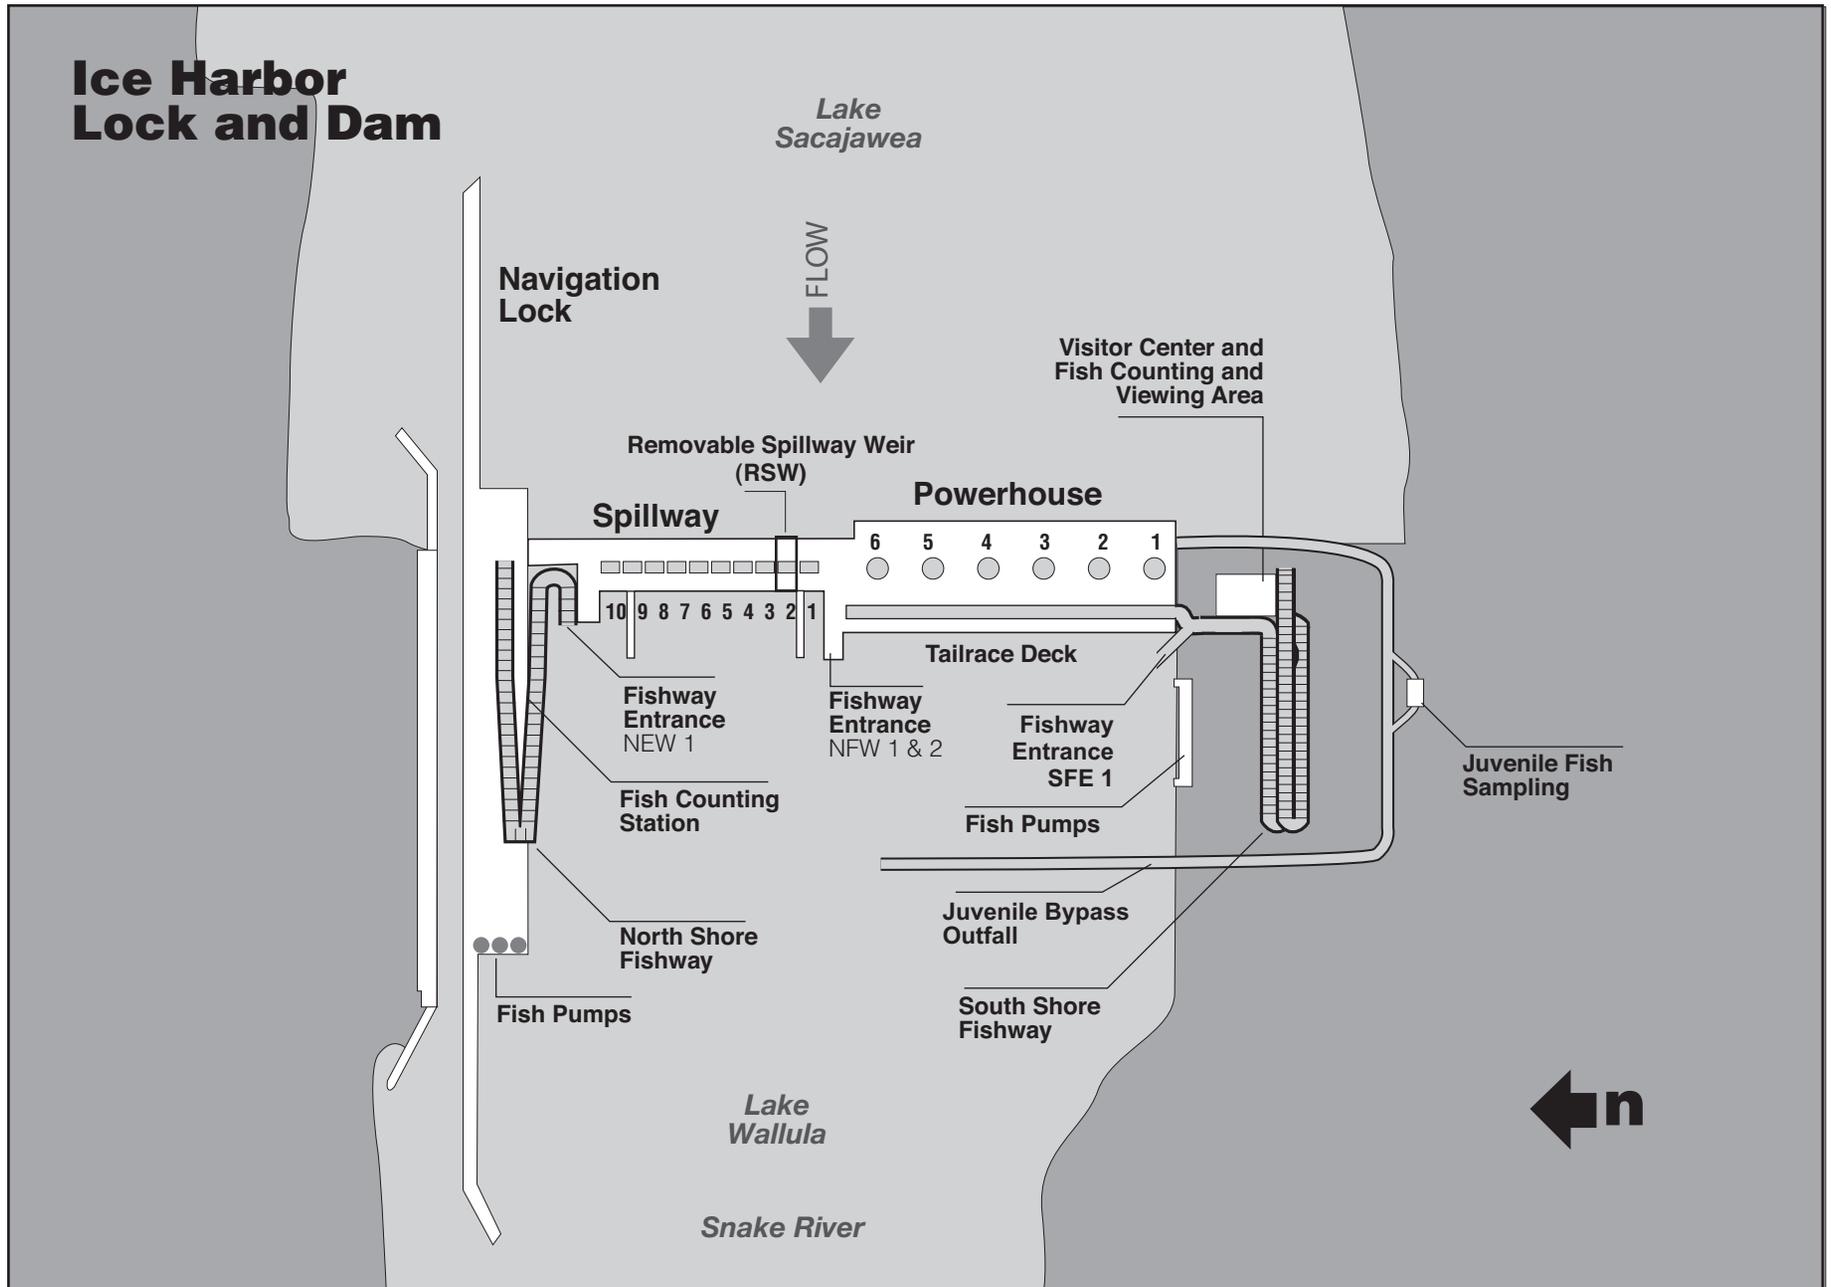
Ice Harbor Lock and Dam General Site Plan.
